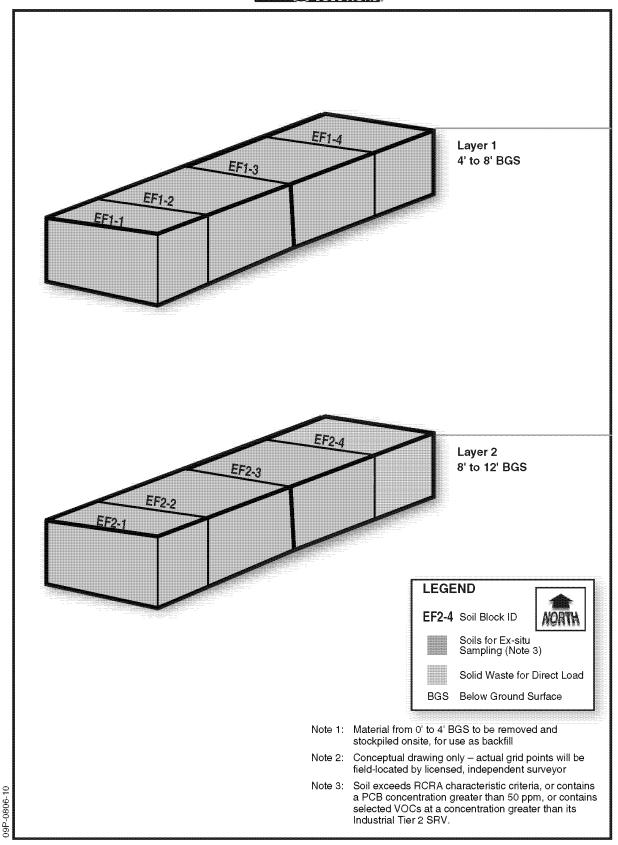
SOIL DISPOSAL PROFILE AREA E/F, WOODBURY SITE WOODBURY, MN
